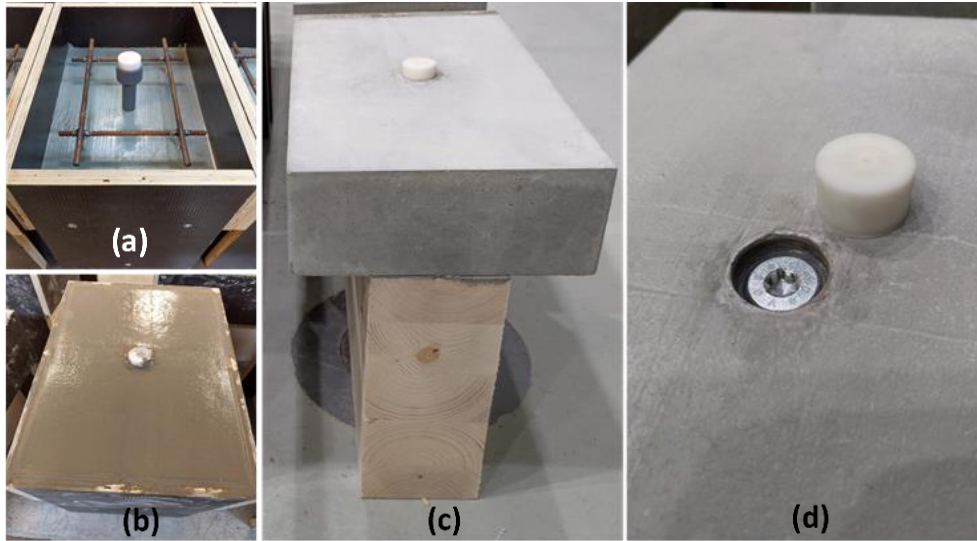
A T-section glulam-concrete deconstructable connection. (a): the prepared formwork, (b): concrete cast onto the formwork, (c): the resulting T-section connection, and (d): the screw head inside the connector after removing the rubber lid.
